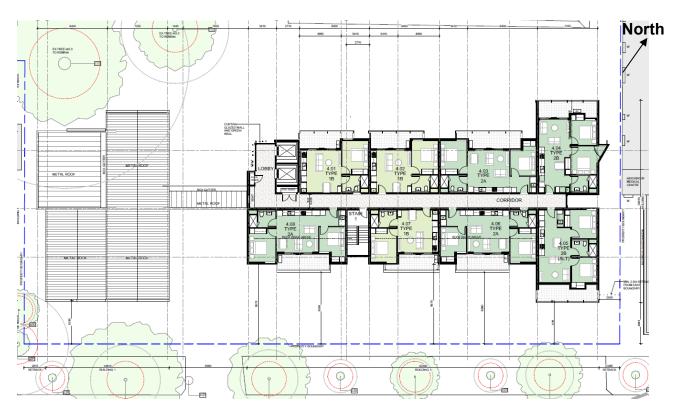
Level 4 floor plan of the proposed Building 1 of the St Andrew's Bendigo Housing Development.
